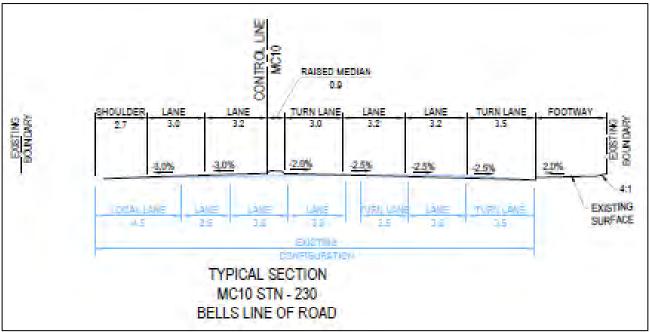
Typical cross section of the proposed Bells Line of Road/Grose Vale Road intersection upgrade
